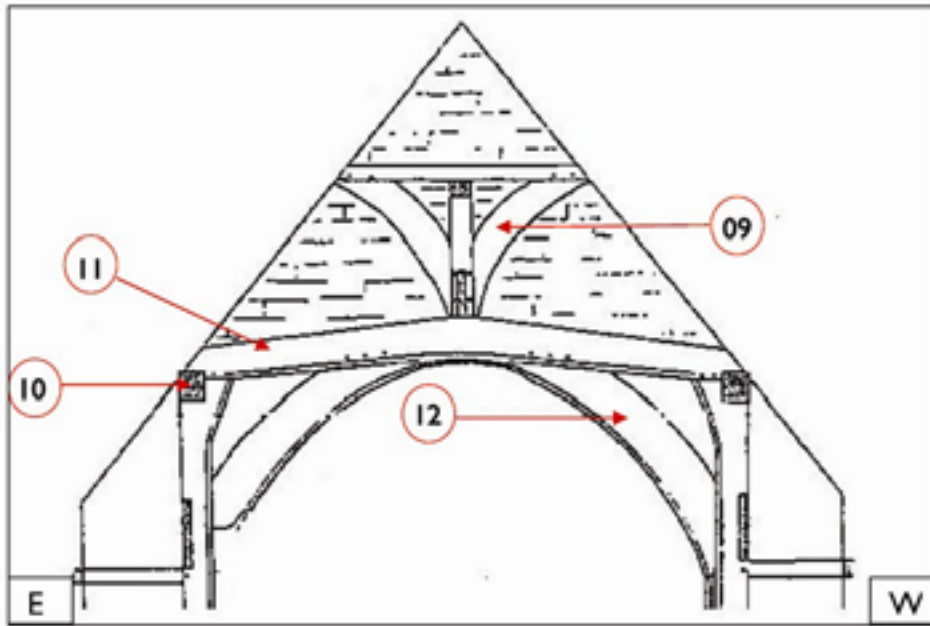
Hall range truss D showing sample locations, viewed looking north to south (based on a drawing by M W Barley 1975)
